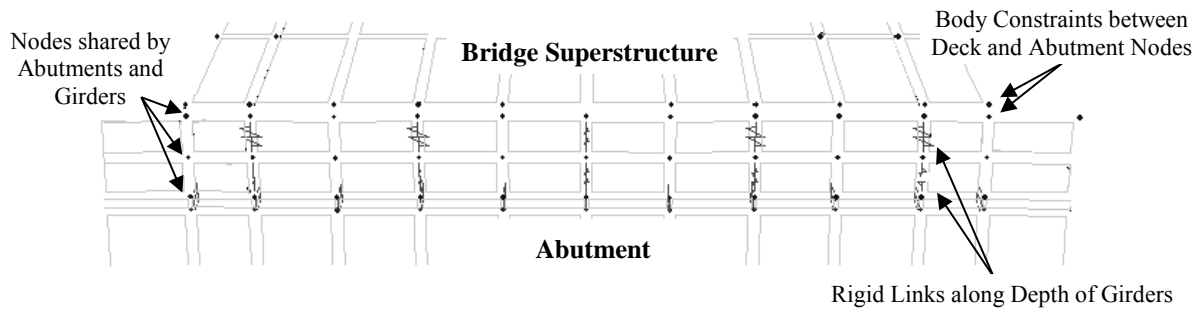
Bridge Superstructure – Abutment Connection Detail
